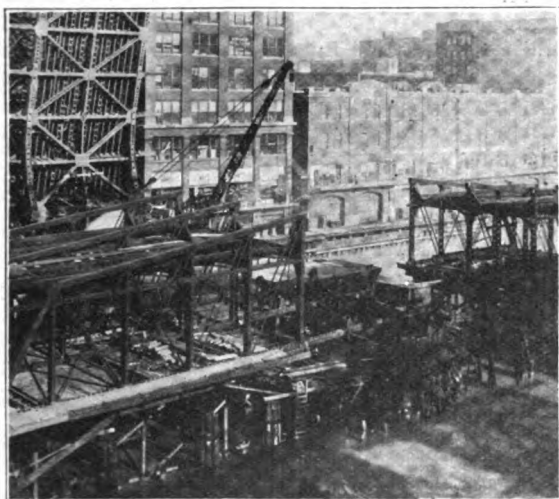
Central Portion of Old Bridge Entirely Removed to Permit Lowering the Leaves of the New Structure.
